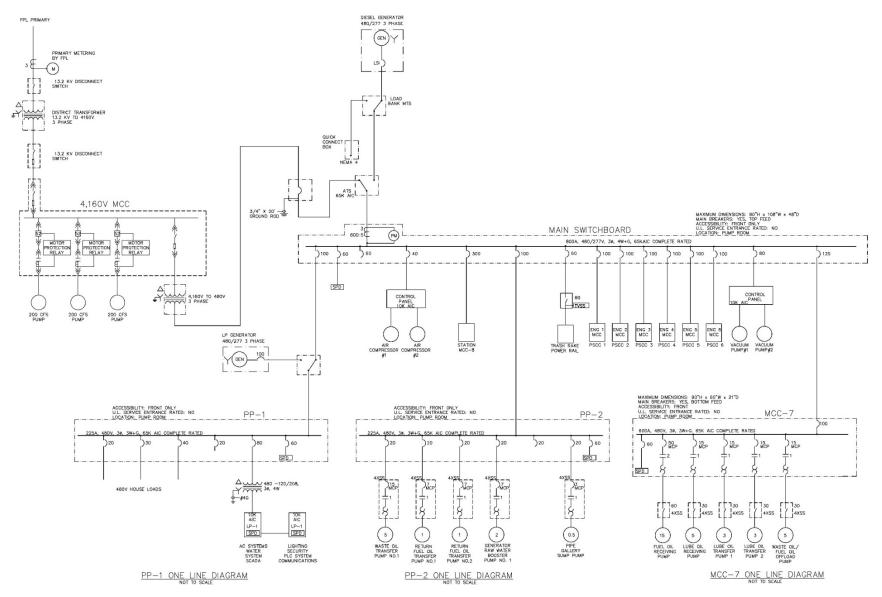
Preliminary Pump Station One-Line Diagram
